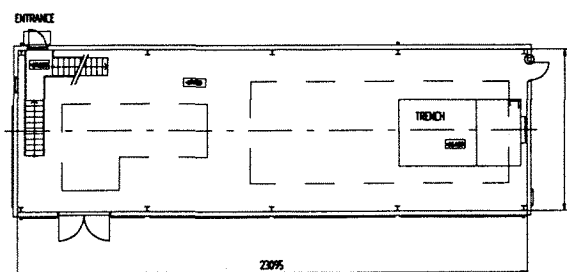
LAYOUT OF LABORATORY, BASEMENT.
